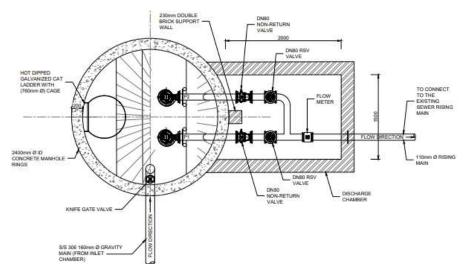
Plan view of the Pump Station & Calve Chamber
